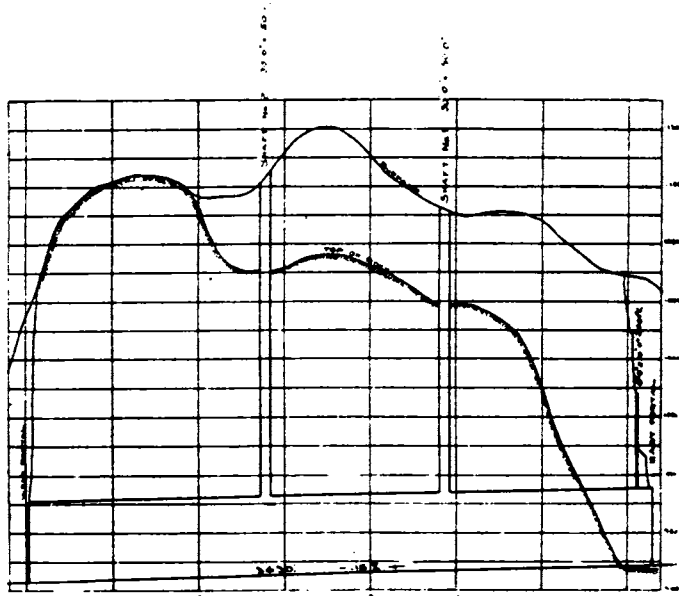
Cross Section of Nicholson Tunnel, D. L. & W. R. R.
